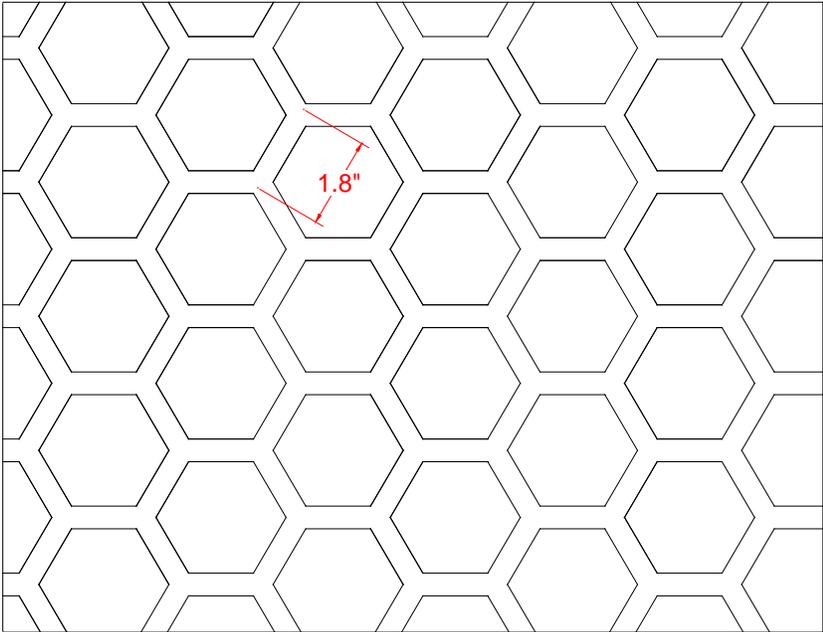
Plan view of a hexagonal pattern for a concrete floor.
